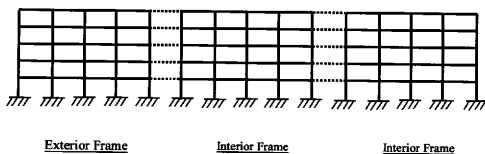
Model of Study Building Used in DRAIN-2DM Analysis
